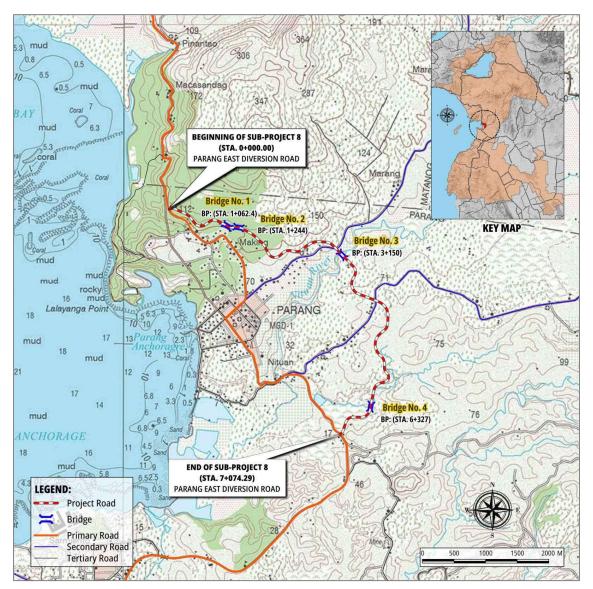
SP-8 Parang East Diversion Road Alignment Layout Plan
